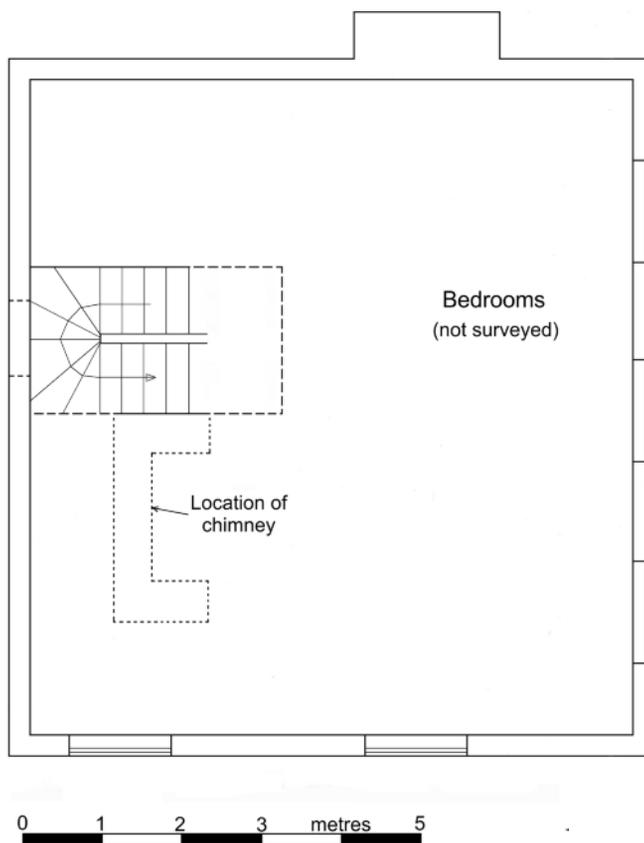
Plan showing the position of the staircase between the first and second floors
